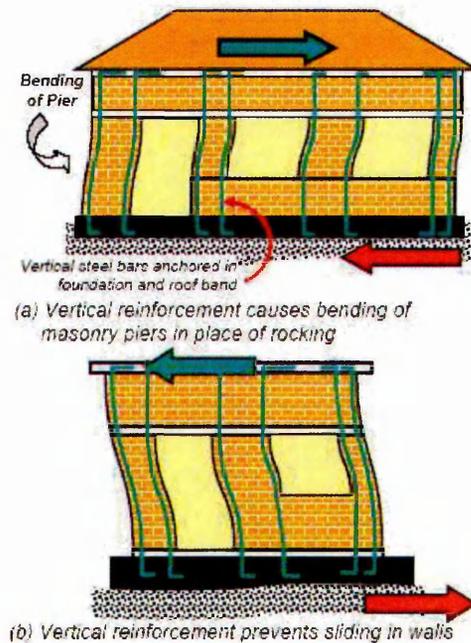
Vertical reinforcement in masonry walls – wall behaviour is modified (IITK-BMTPC, 2003)
